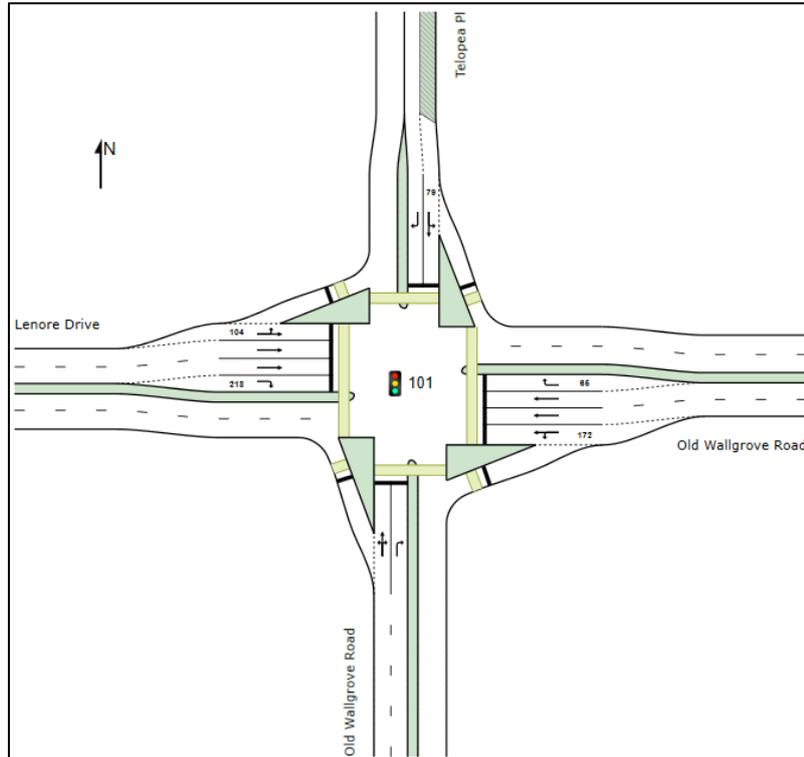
SIDRA Existing Intersection Layout – Old Wallgrove Rd / Lenore Dr / Telopea PI
